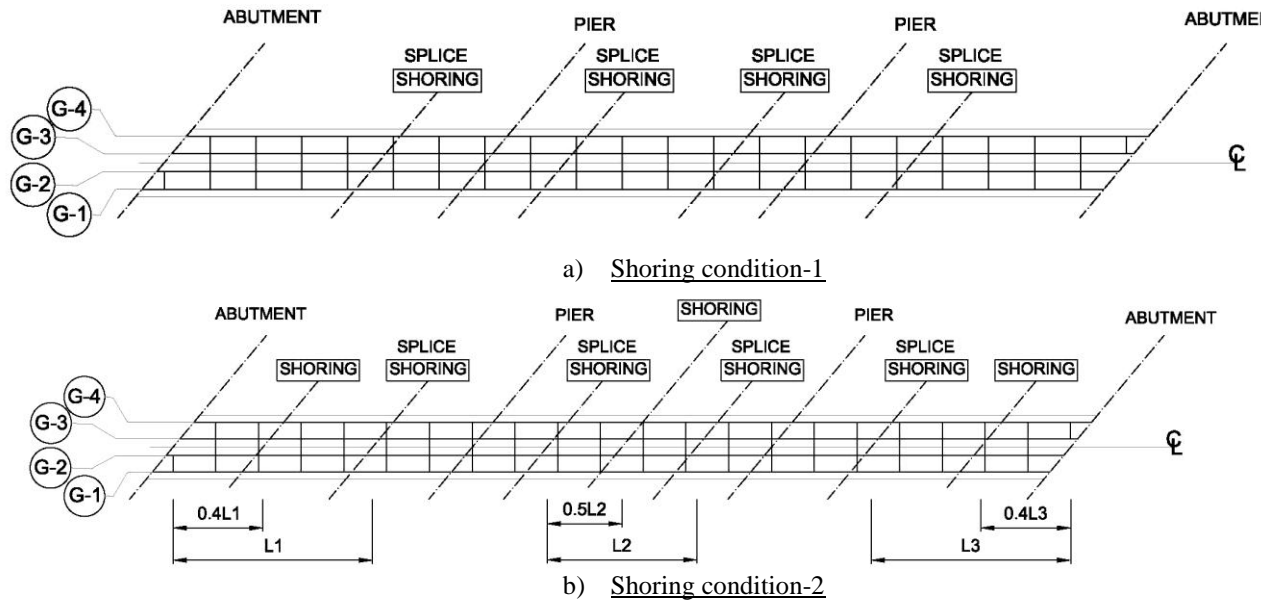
Shoring Conditions for Three-Span Skewed Bridges.
